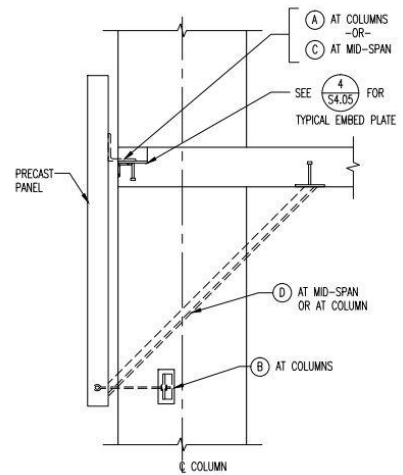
Precast Elevation Detail - by Cagley and Assoc.
